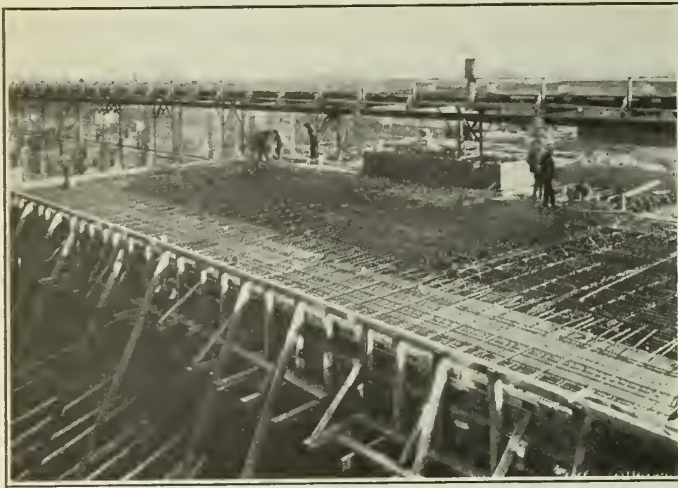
View showing Belt Conveyor and Reinforcing of Double Track (simple) Slab in Place Ready for Concreting.
